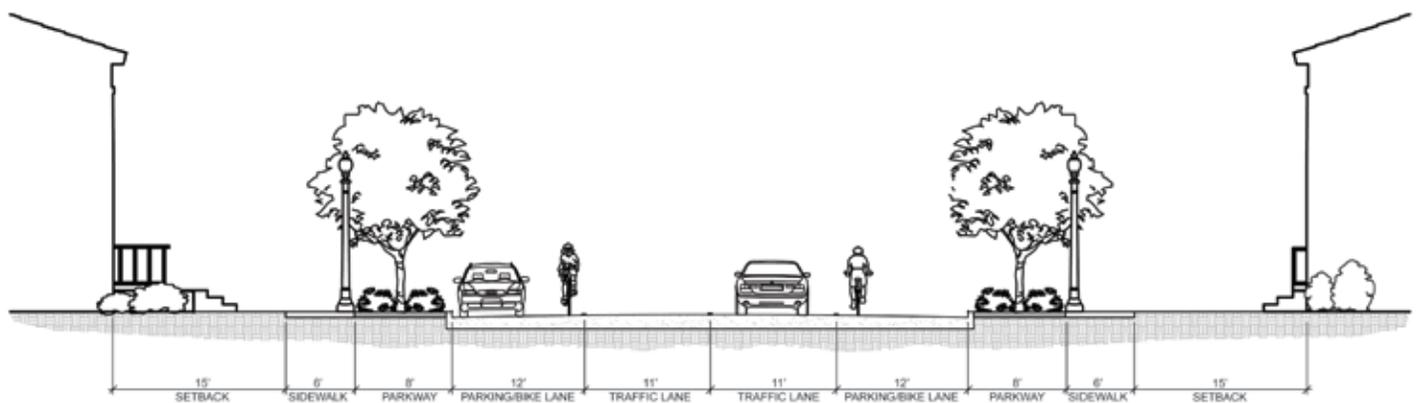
Proposed cross section of 6th Street from Pacific Coast Highway to Orange Avenue
